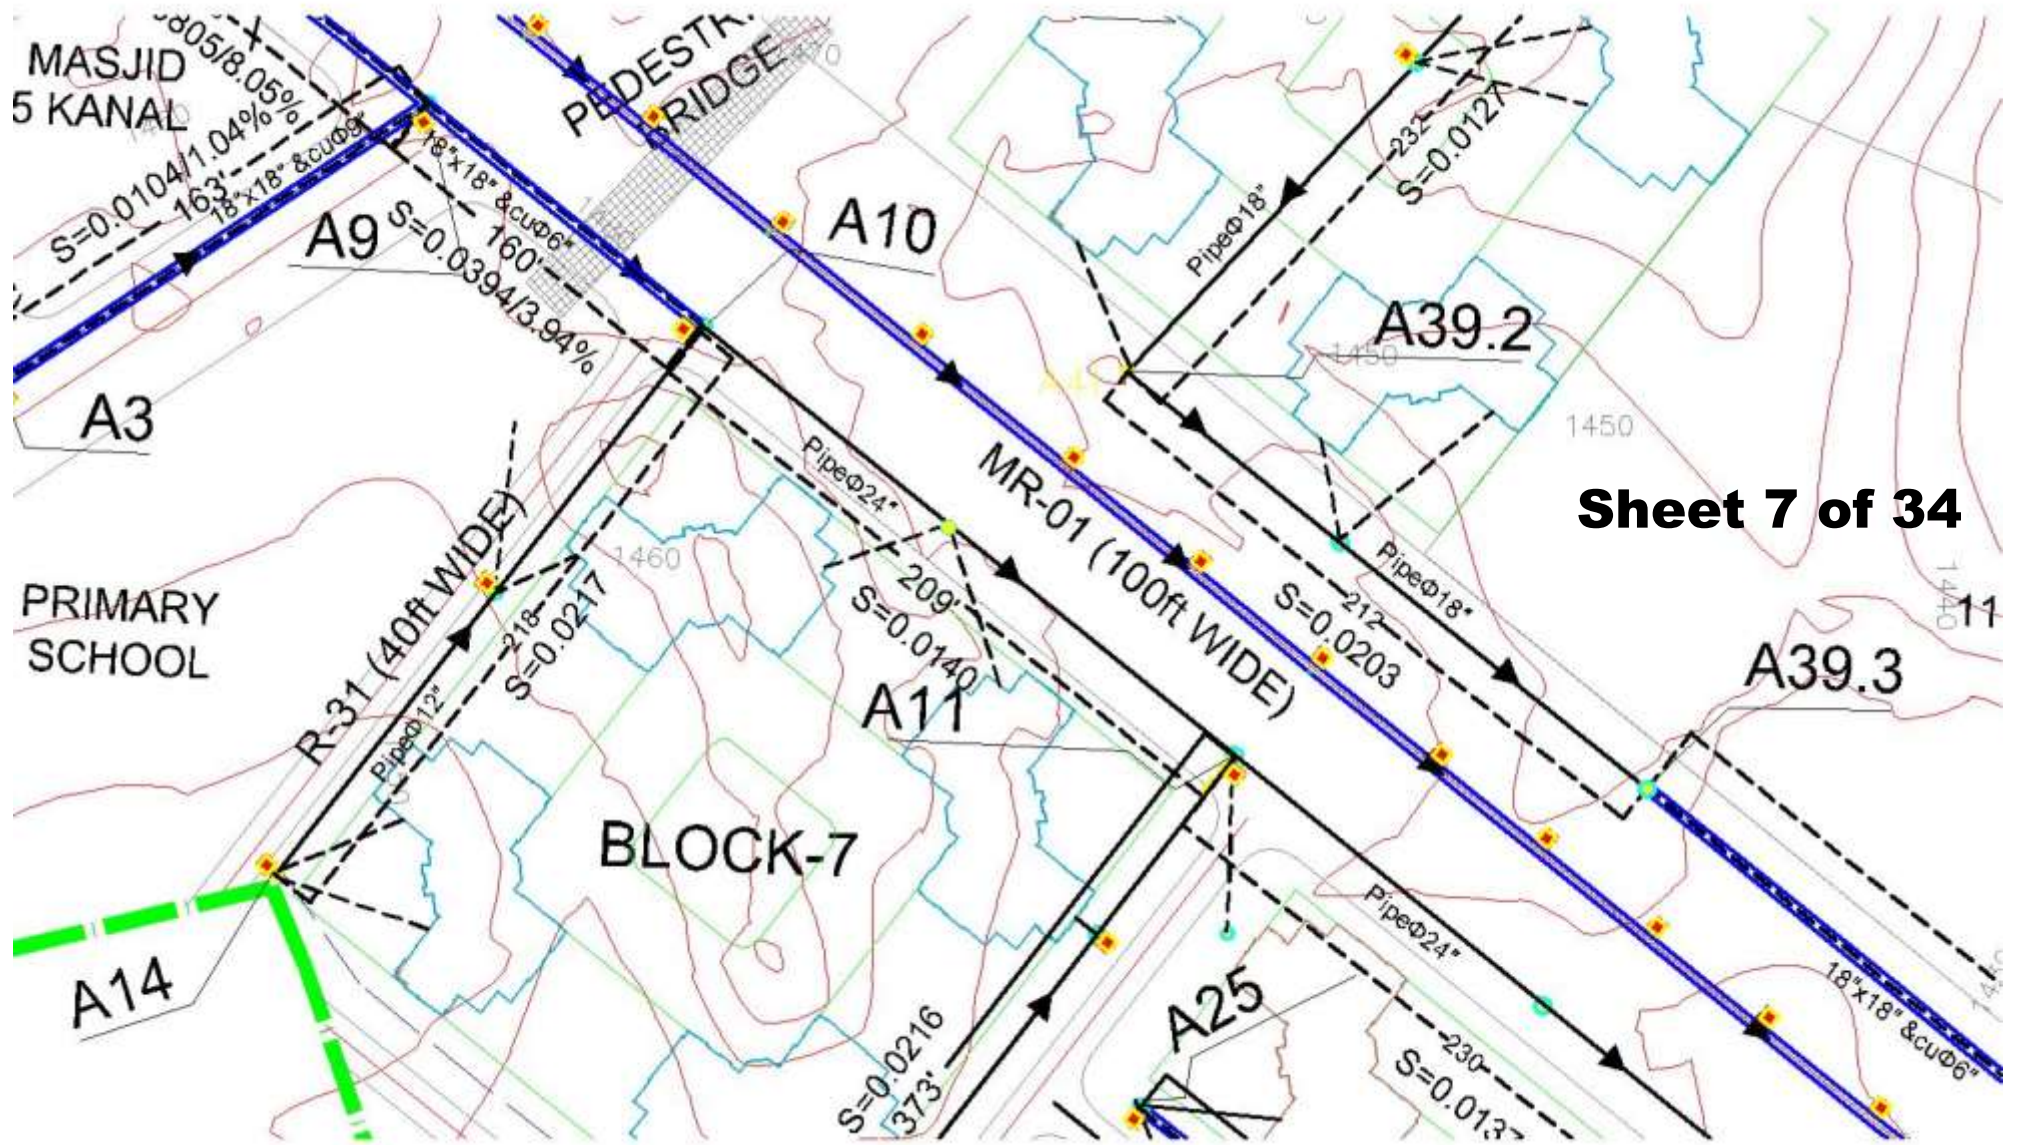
Combined drainage layout plan of Zone-1 at L/S of MR-01
